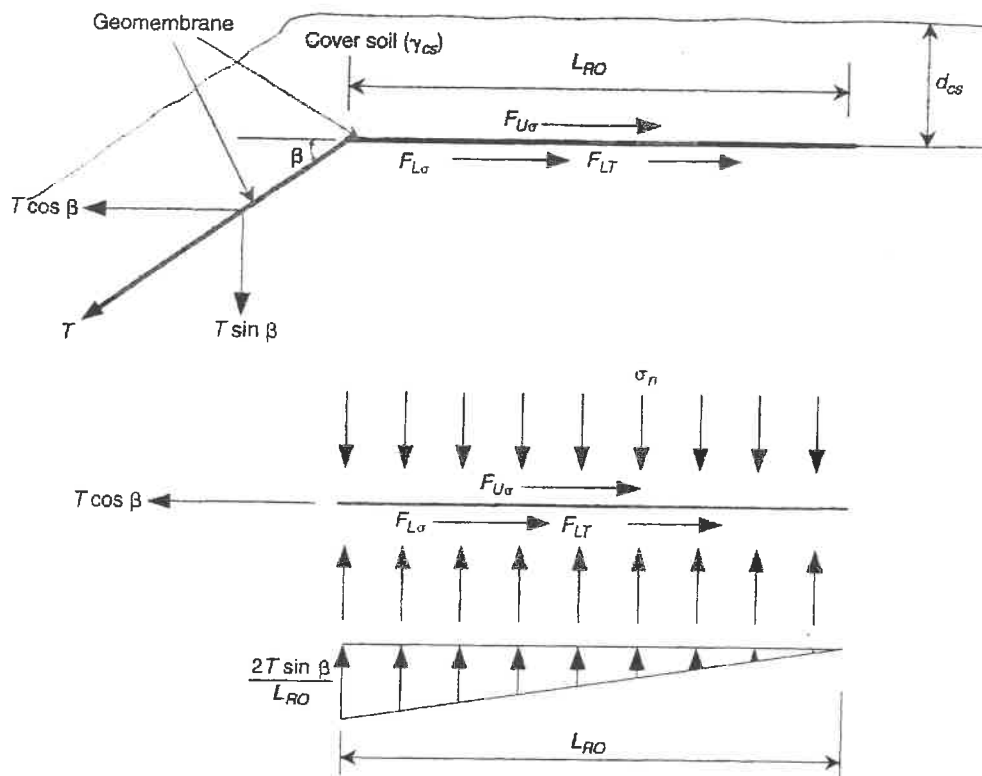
Cross section of geomembrane runout section and related stresses and forces involved.
